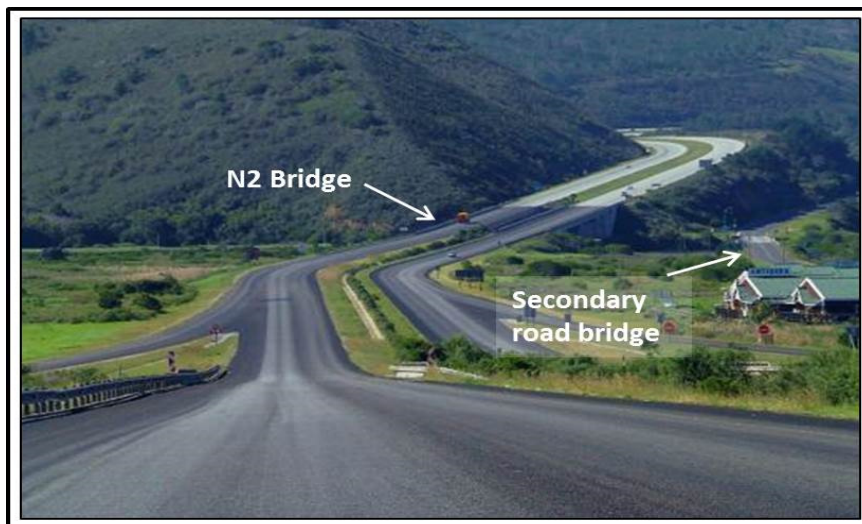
N2 and secondary road bridges aerial view (source: www.wheretostay.co.za)
